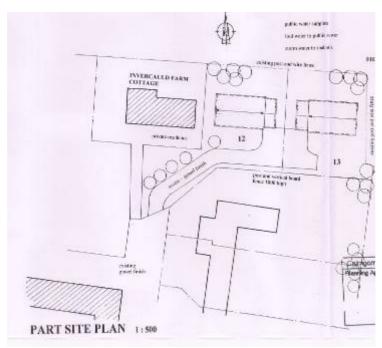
Proposed site layout plan (units 12 and 13 are the subject of this current application)
